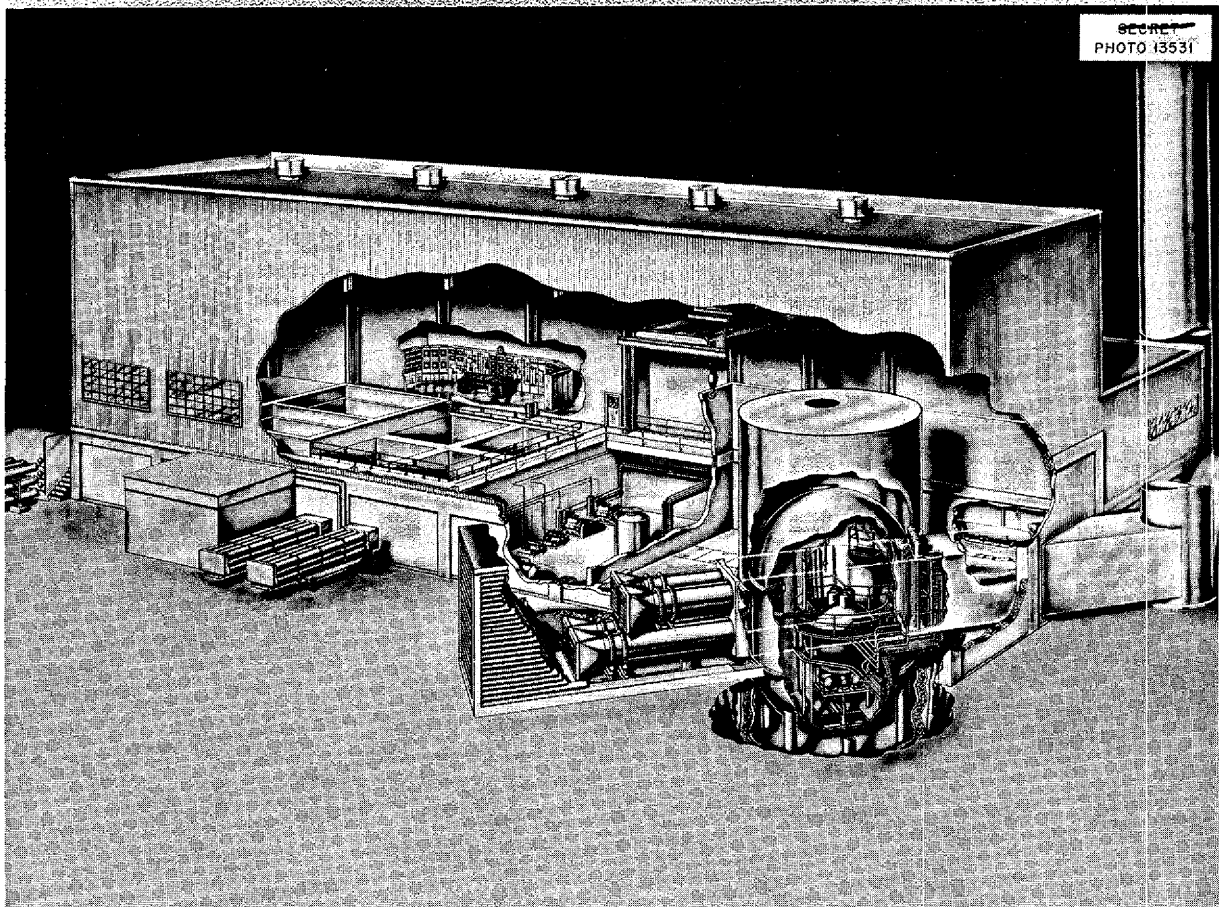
Perspective of Proposed ART Installation in Addition to Present ARE Building Showing Double-Walled Tank.
